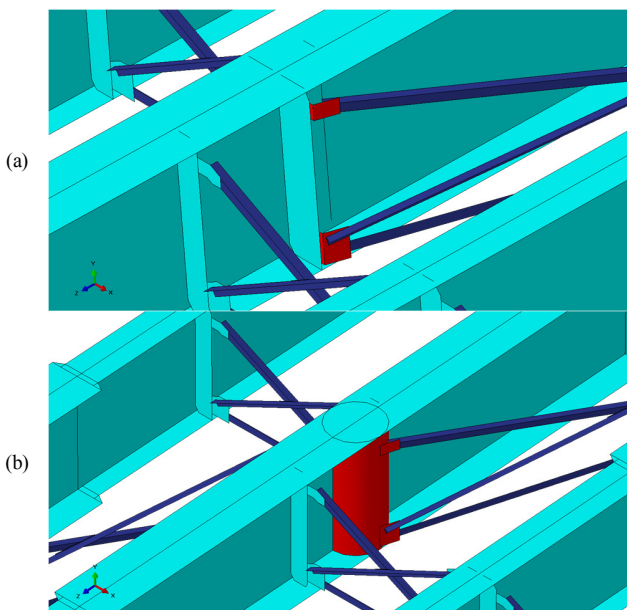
Pier skew support region connection details: (a) FE modeling of the existing connection (bent plate) and (b) FE modeling of the new proposed connection (pipe stiffener).
